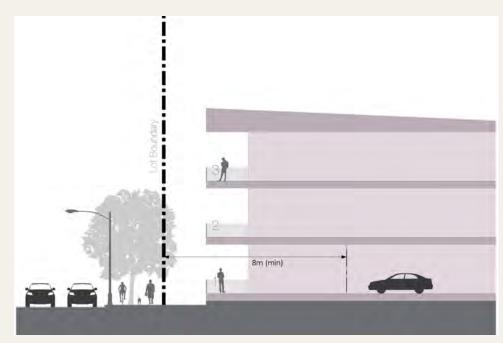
RESIDENTIAL 1 R-AC0 PARKING - MULTI-STOREY CAR PARKS SLEEVED BEHIND GROUND FLOOR USES
